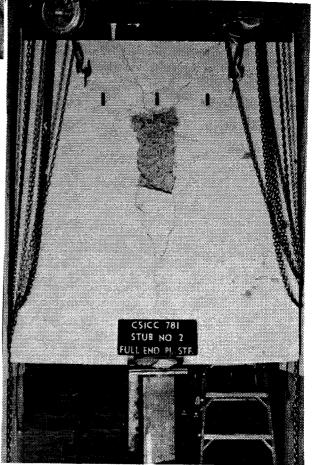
Cracking Pattern in Slab of Stub Specimen I
